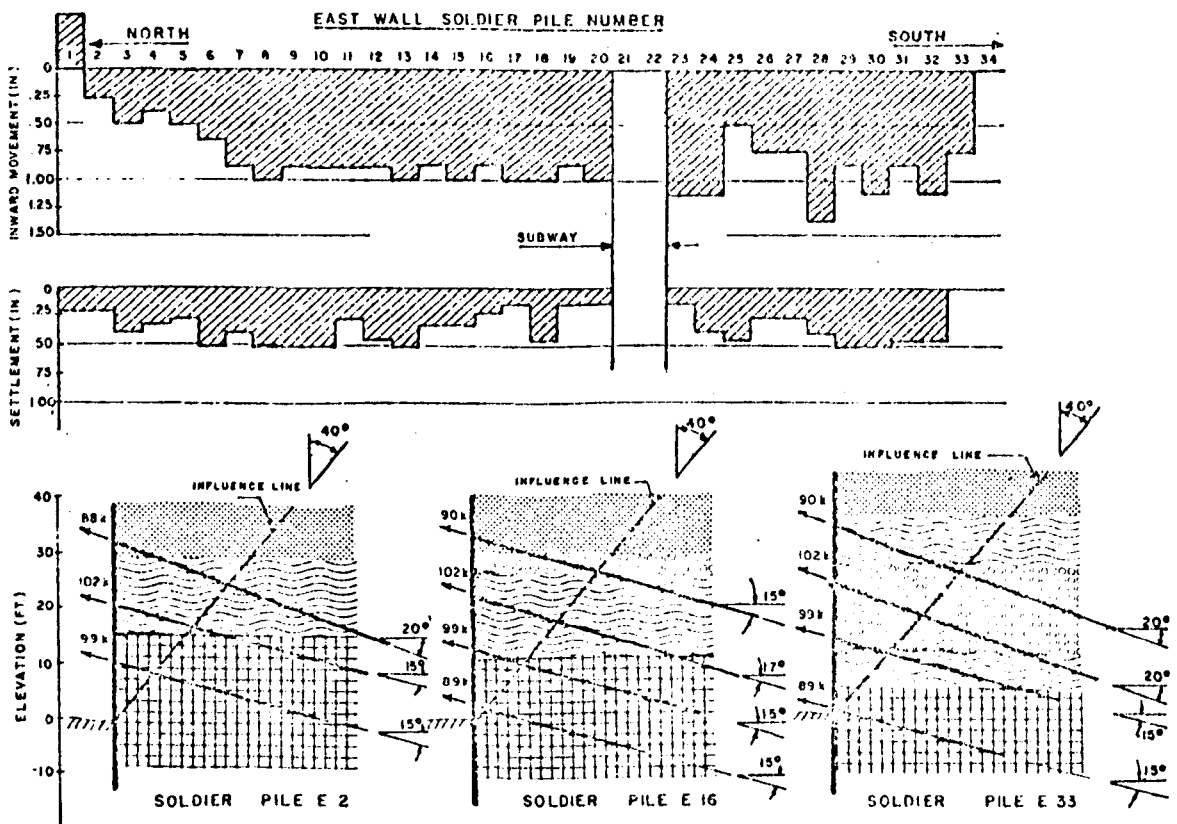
PILE MOVEMENT AND TIEBACK LOCATION-EAST WALL
